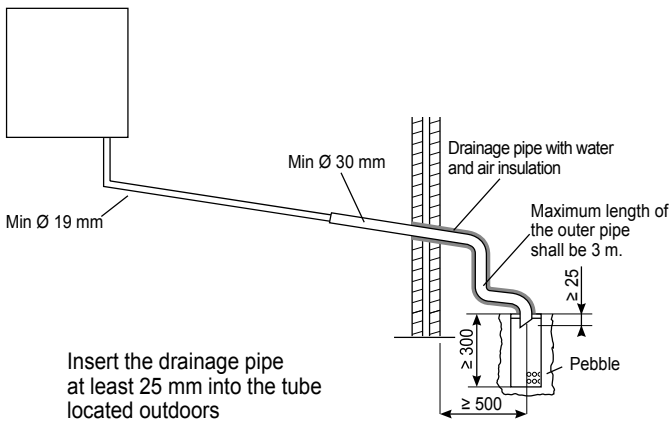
Outside Connection of Condensate Water Drainage Pipe
